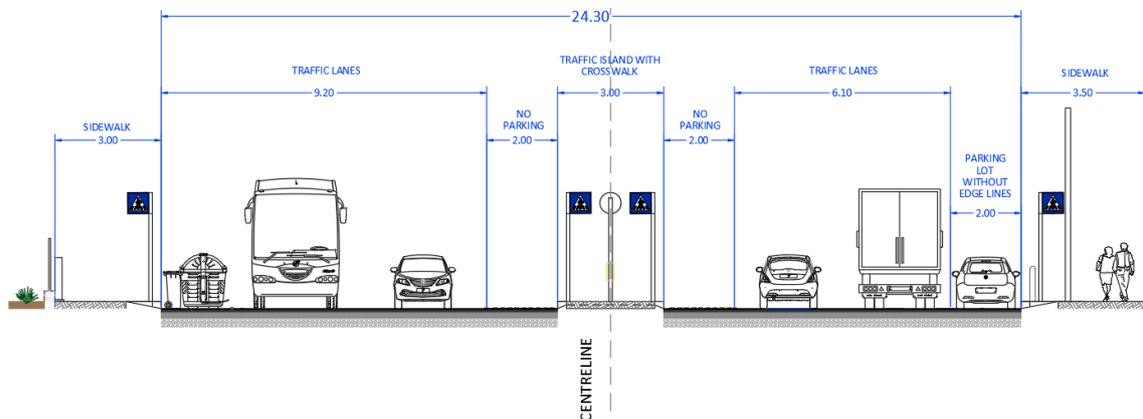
Cross section, section U-U', intersection IV - Viale Papa Giovanni XXIII.
